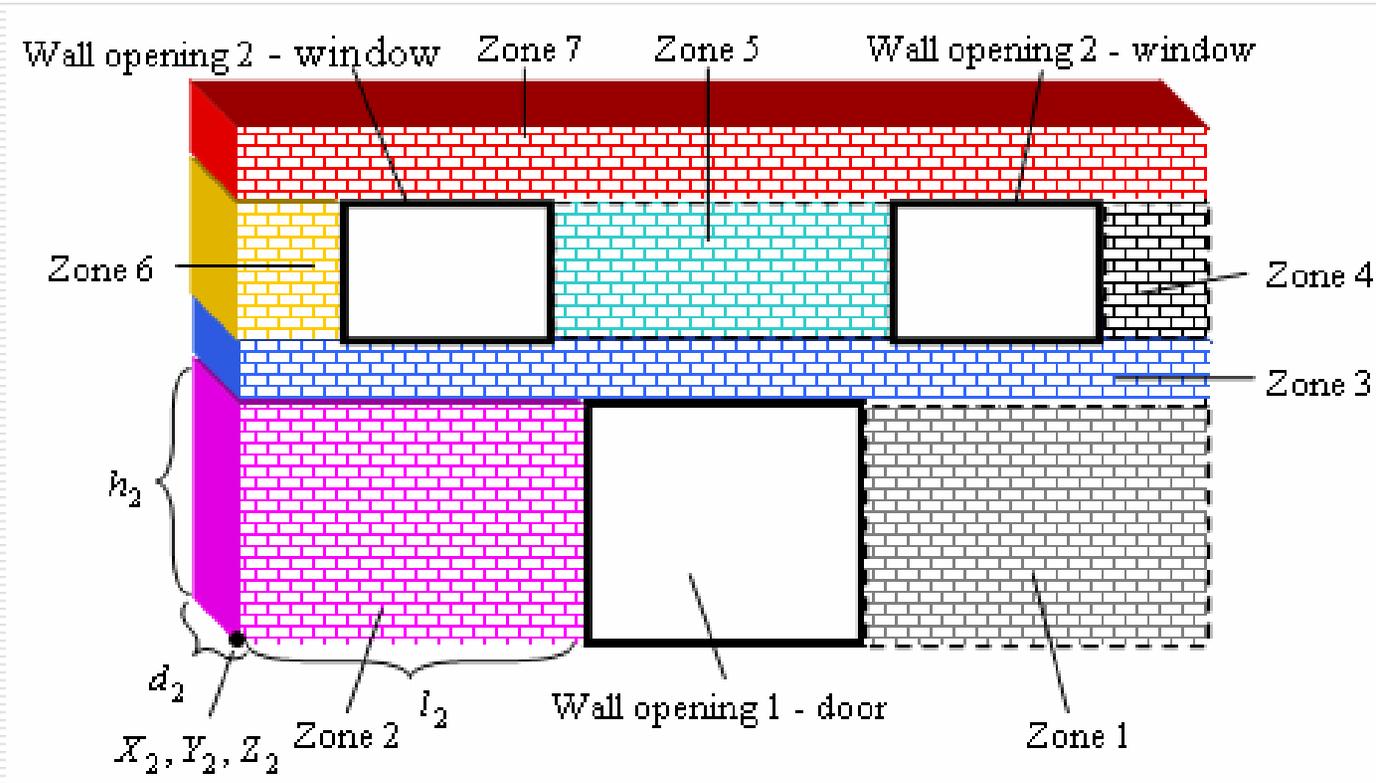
Stage 1: extraction of geometry data and locating data for elementary wall zones (from architecture plans and construction specs.)
